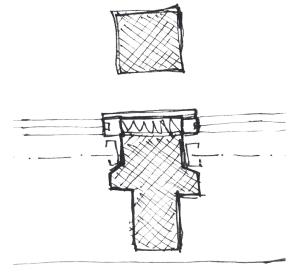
Sketch of detail showing relationship facade system/ loadbearing structure.
